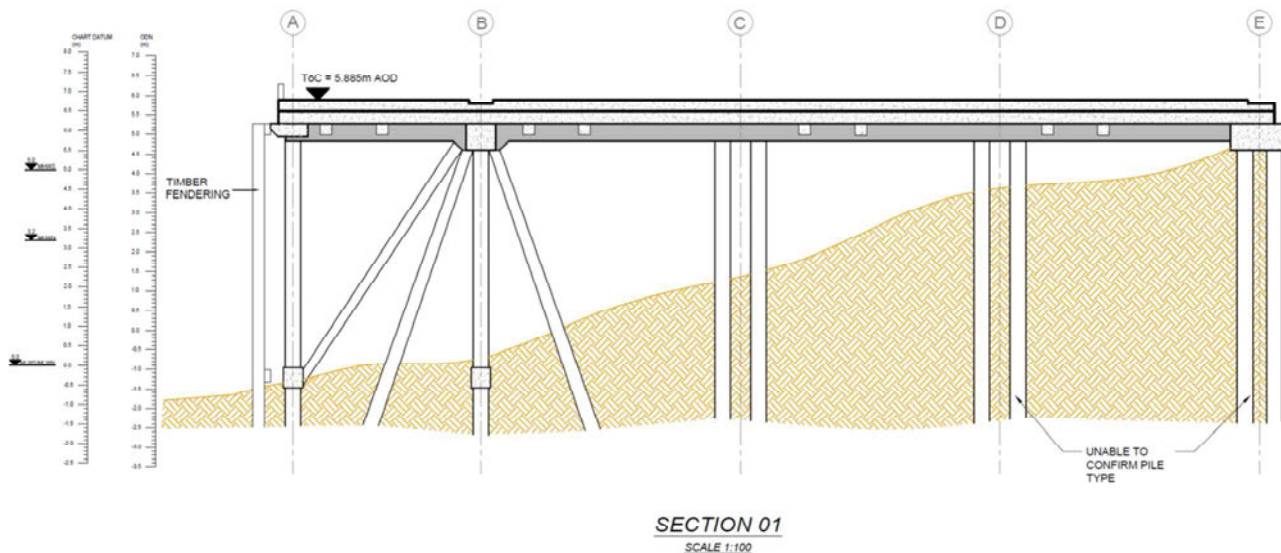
Cross section of Flixborough Wharf taken from GA Plans of Existing Wharf
